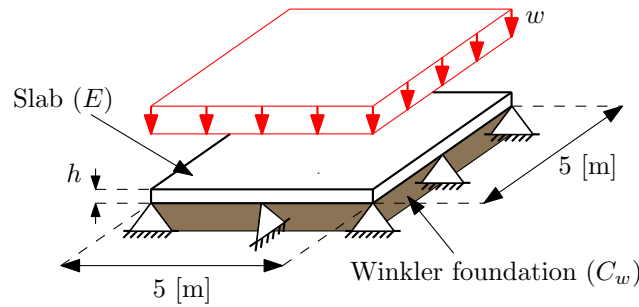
Reinforced concrete slab resting on a Winkler foundation
